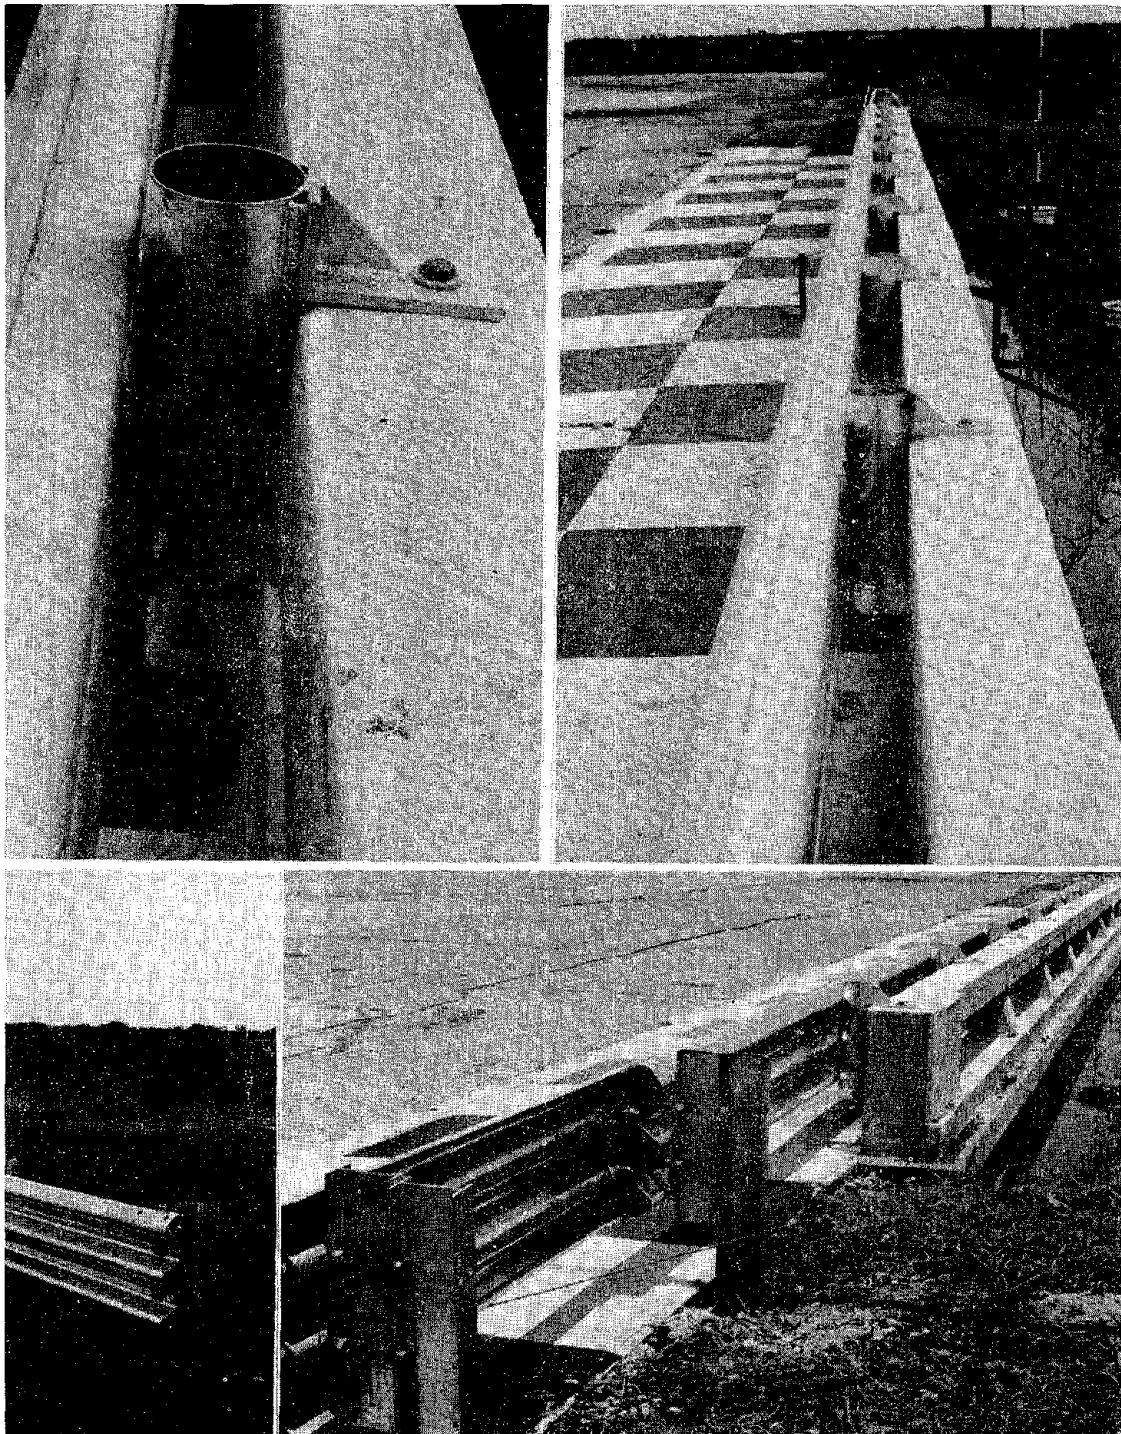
TYPICAL CATEGORY II BRIDGE RAILING INSTALLATION MODIFIED WITH R(II)-1 RETROFIT DESIGN
